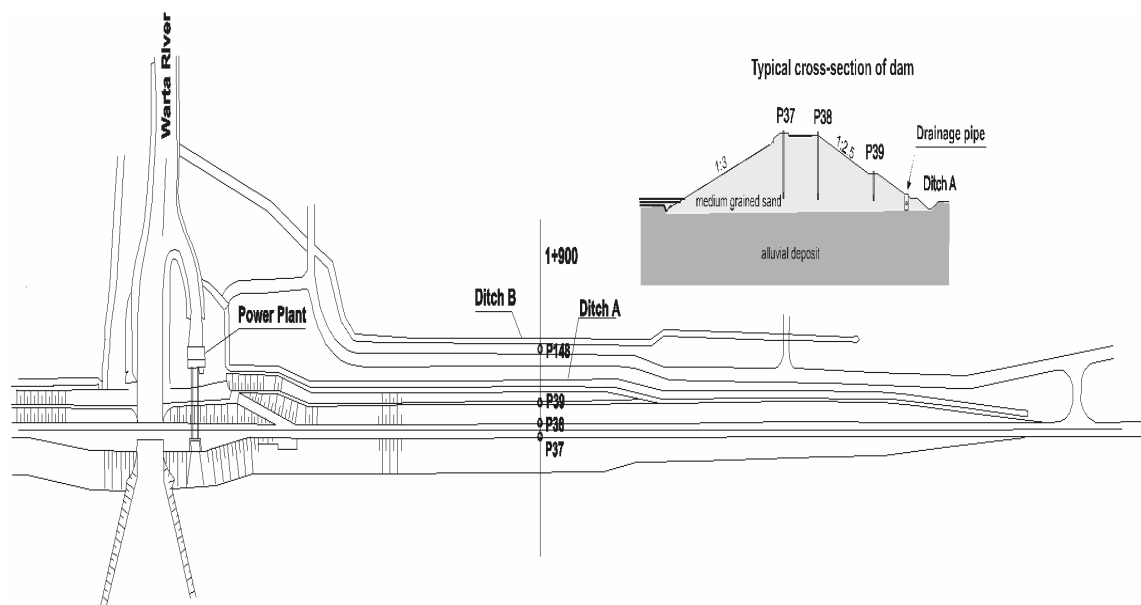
Detail Cross-Section Sketch of the Jeziorsko Earthfill dam with depicted soil layers.
